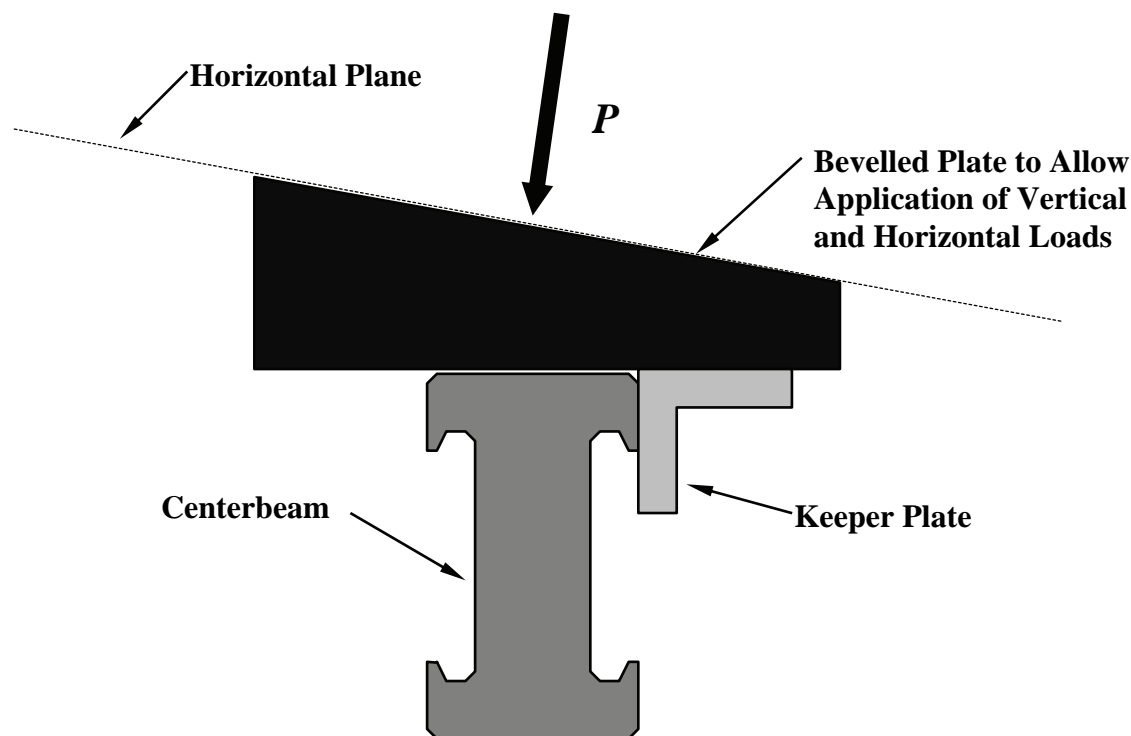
Typical Fixture Used to Apply Load to Centerbeam
